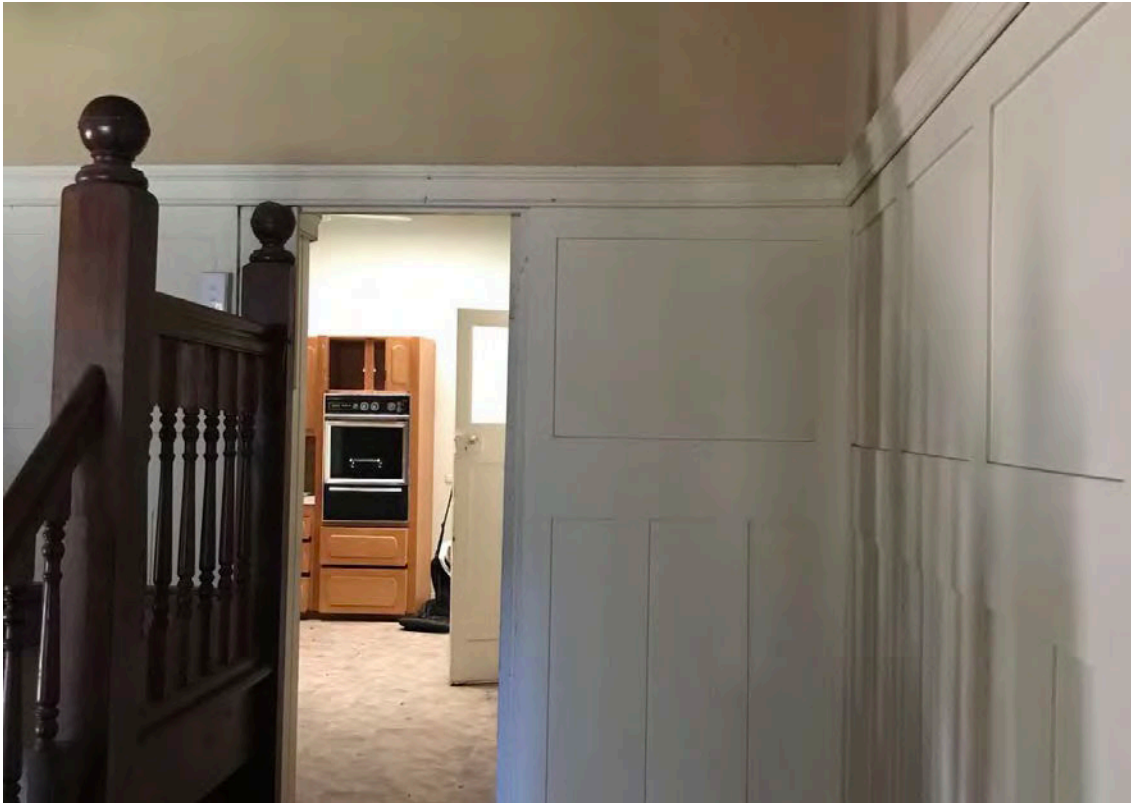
Incongruous fitting of internal stair across kitchen doorway
